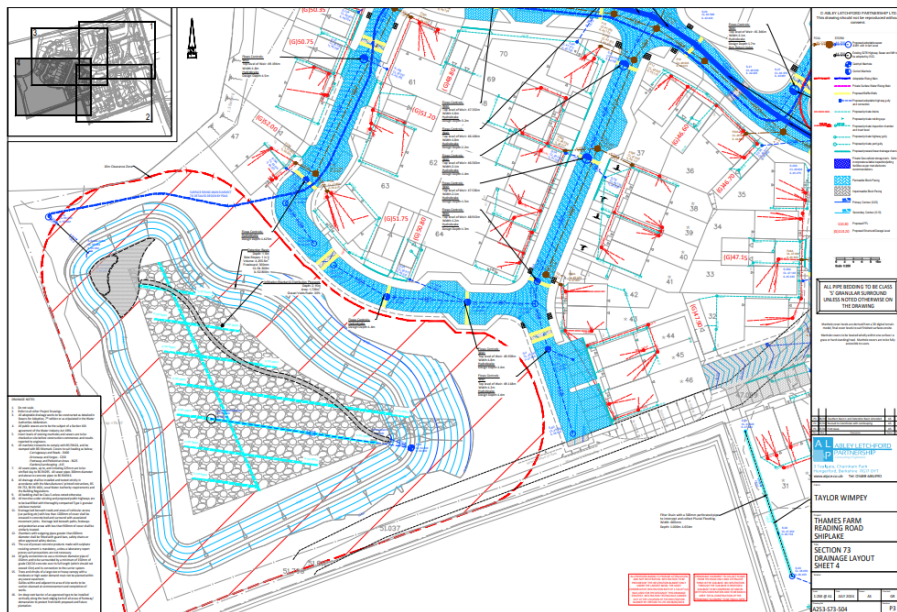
August 2024 drainage layout plan 4 © Taylor Wimpey
